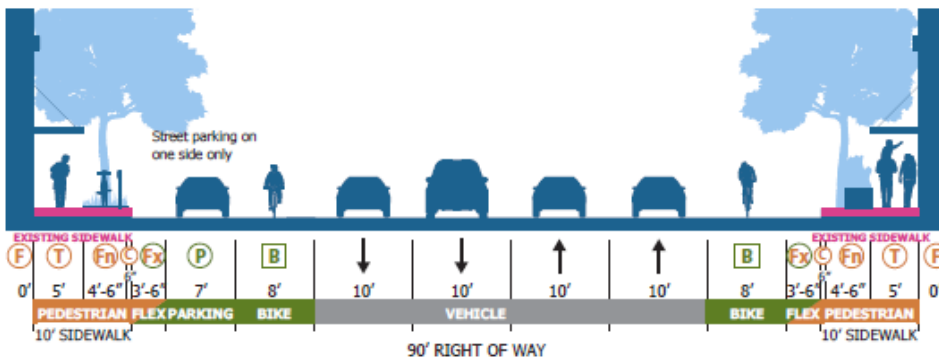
Example City Connector Street Cross Sections (4-Lane)
